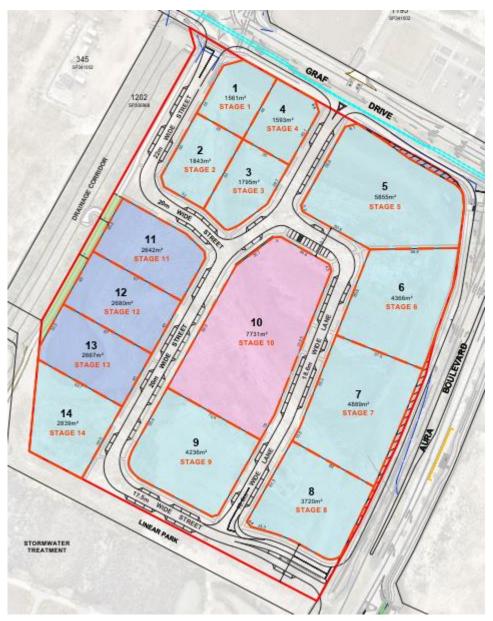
Stage 22A Plan of Development: Appendix C – Staging Plan (RPS 20/09/2024)
